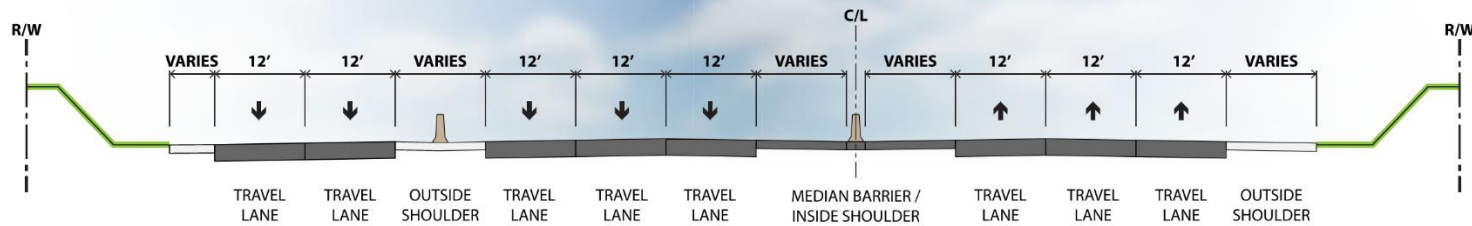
Typical Section of I-65 from North Split to West St in Downtown Spoke
